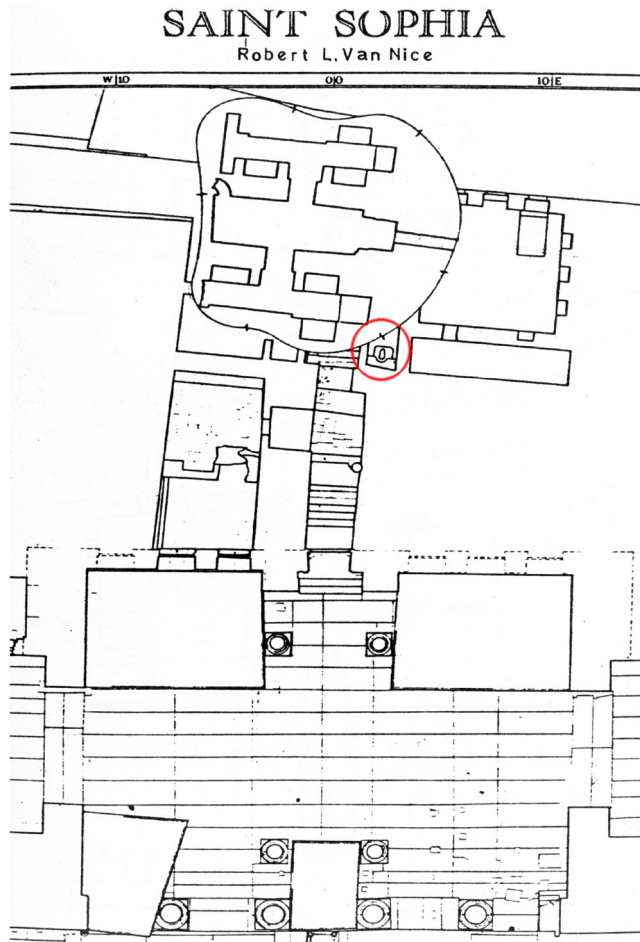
Detail from the ground floor plan of Hagia Sophia (Van Nice, 1986). (The stone toilet is visible in the red circle).
